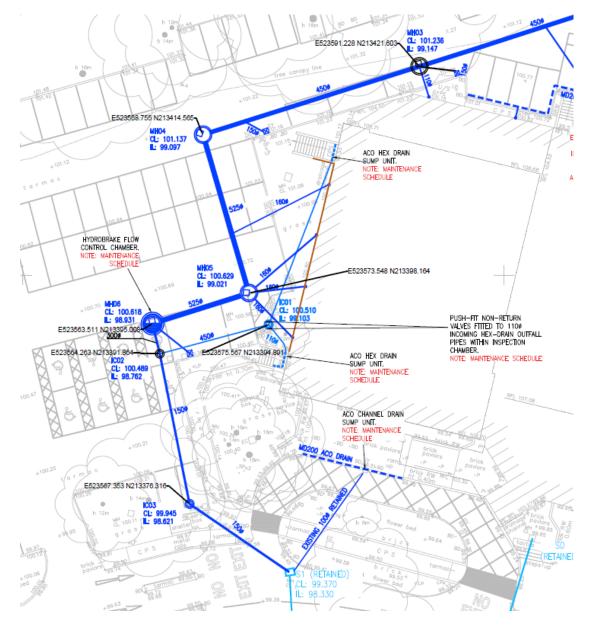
As built surface water drainage extract (as taken from EAS drg. Ref; 2486/AB-001)
